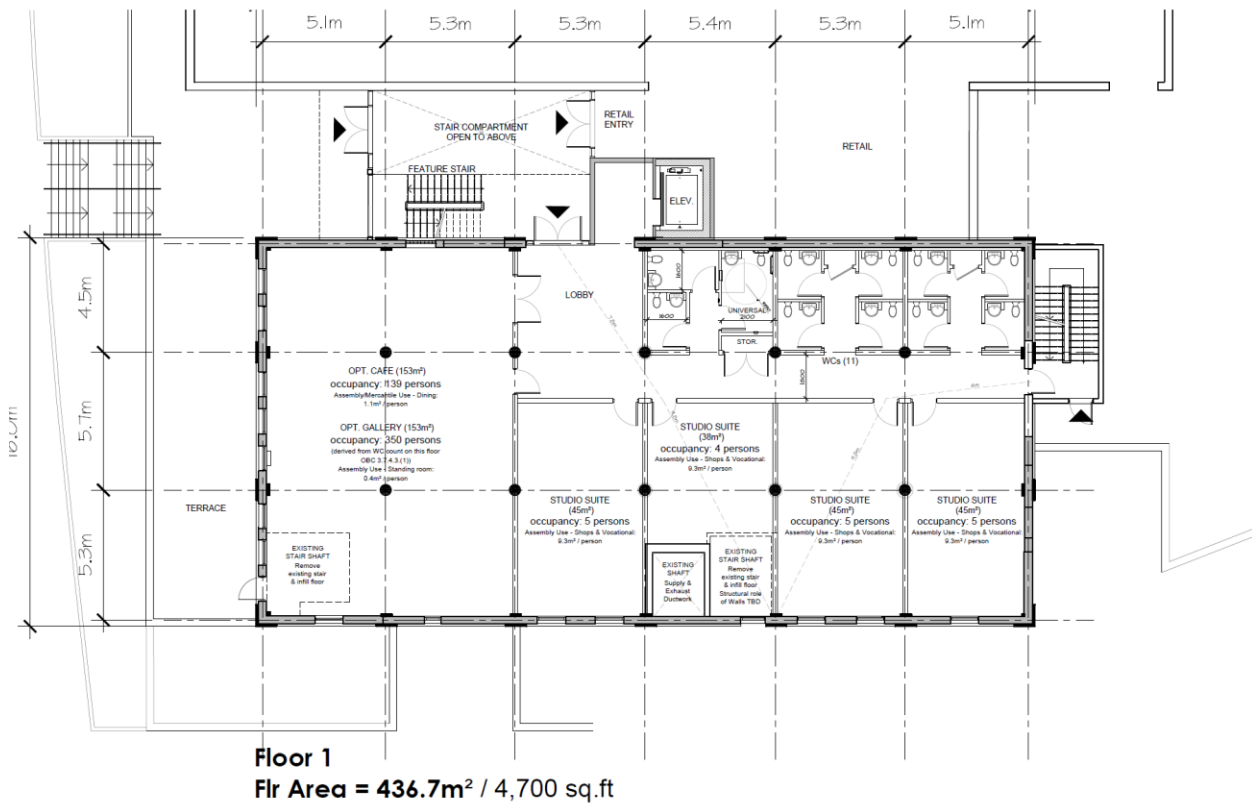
Ground Floor Plan illustrating the layout of the link with the mushroom columns retaining the floor grid.
